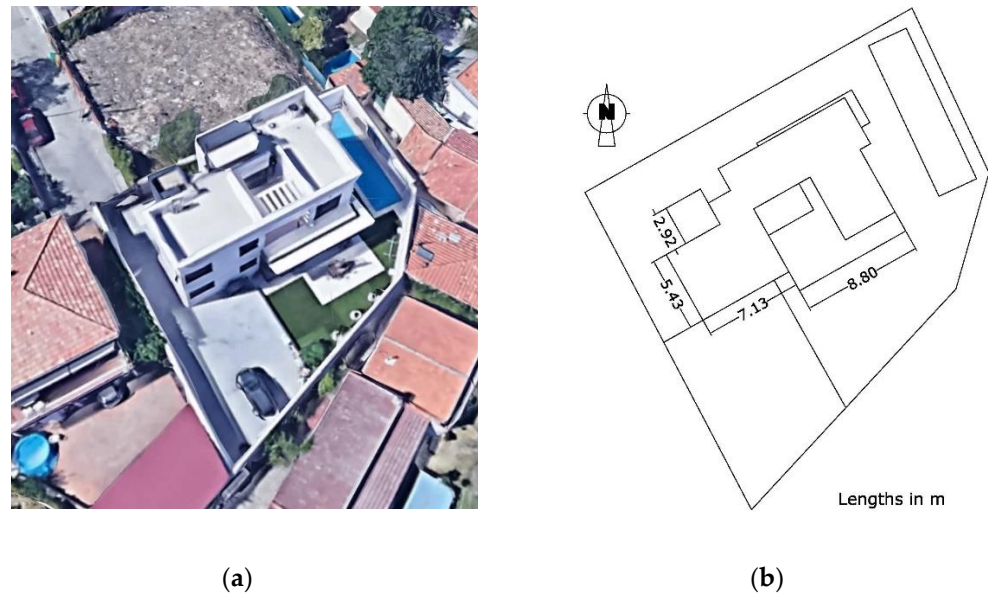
Residential building under study before PV installation. (a) Satellite image (Google Earth) (b) Floorplan with basic dimensions and orientation.
